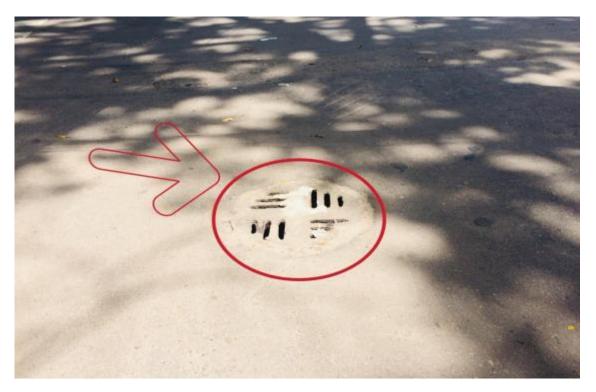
Manhole place in wrong position of Tigerpass intersection.
